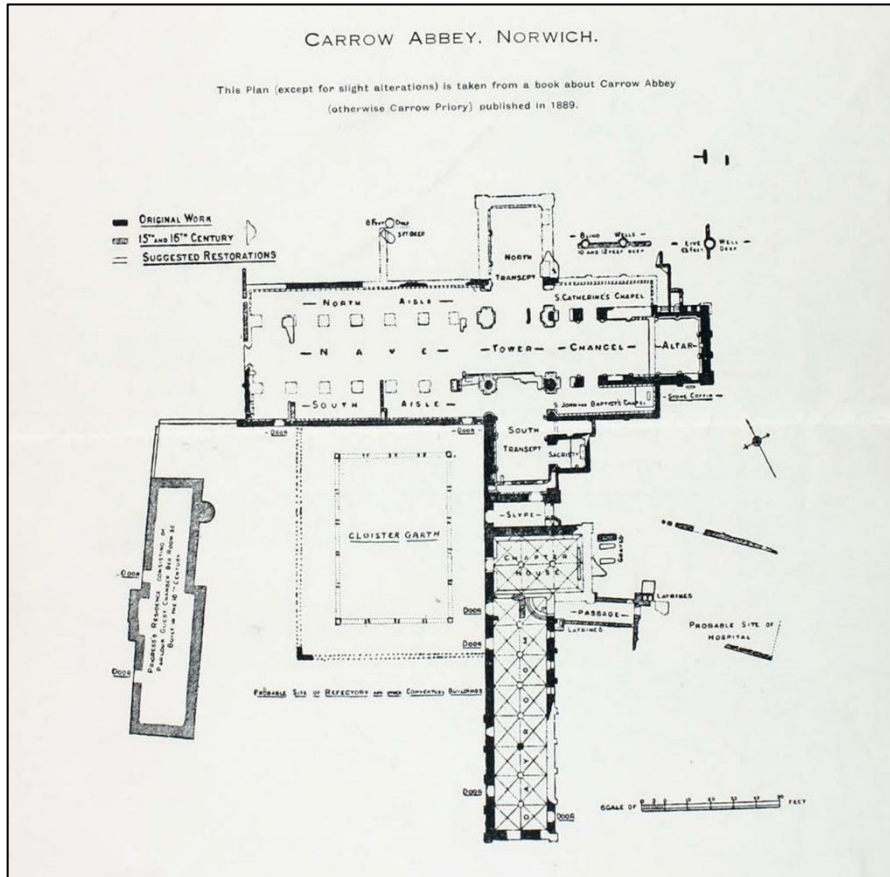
Plan of Carrow Abbey based on 1880-1 excavation
